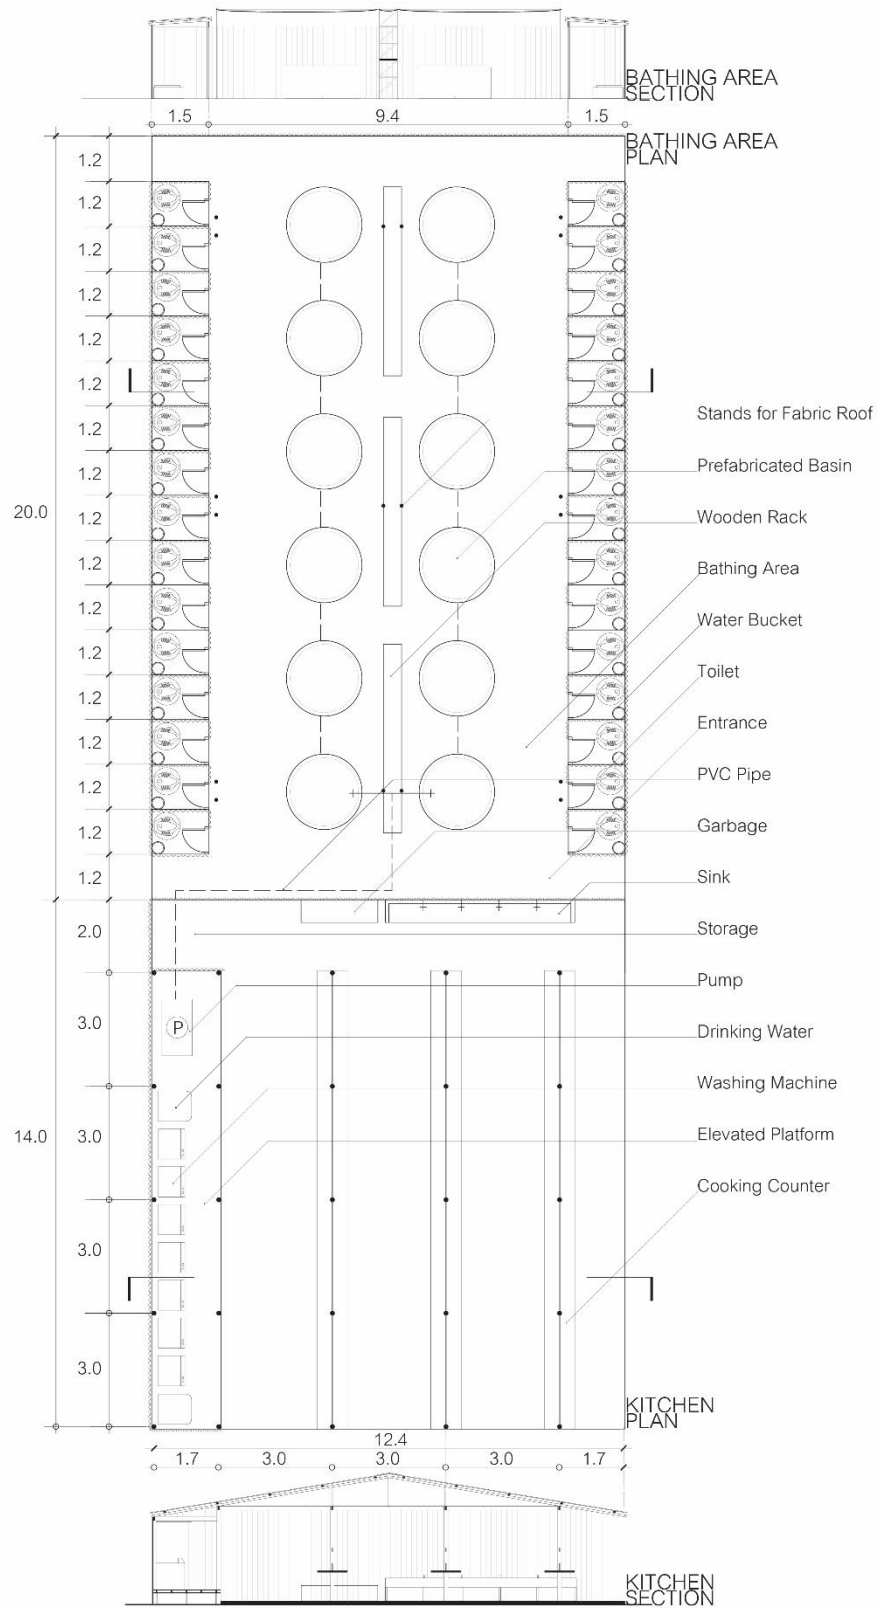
Plans and sections of kitchen and bathing area, Scale 1:200
